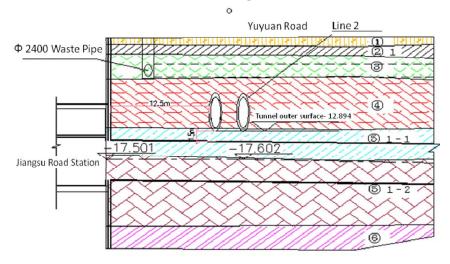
Soil section of break-in hole at Jiangsu Road Station
